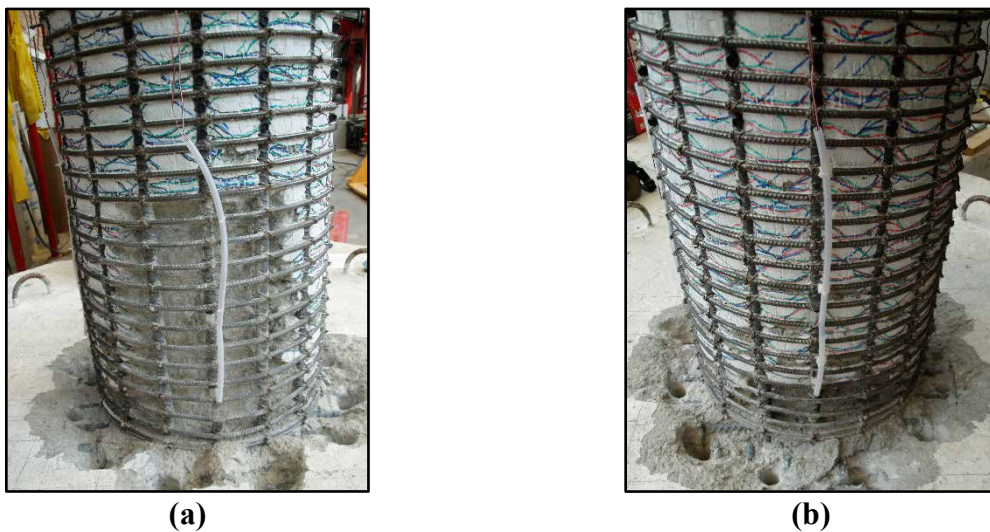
Damage state of column (a) North face with concrete stripped from fractured bars; (b) South face with original column concrete.
